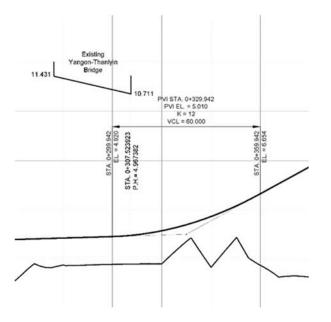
Surveyed Location and Soffit Level of Existing Yangon - Thanlyin Bridge
